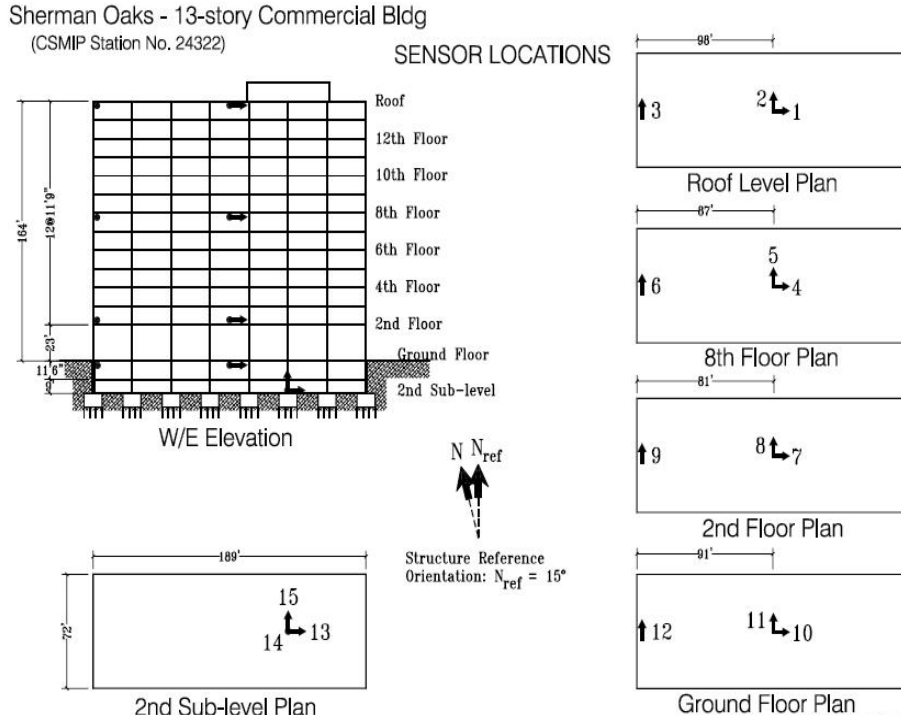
Layout of the sensors installed at Sherman Oaks building (taken from CSMIP web site).
